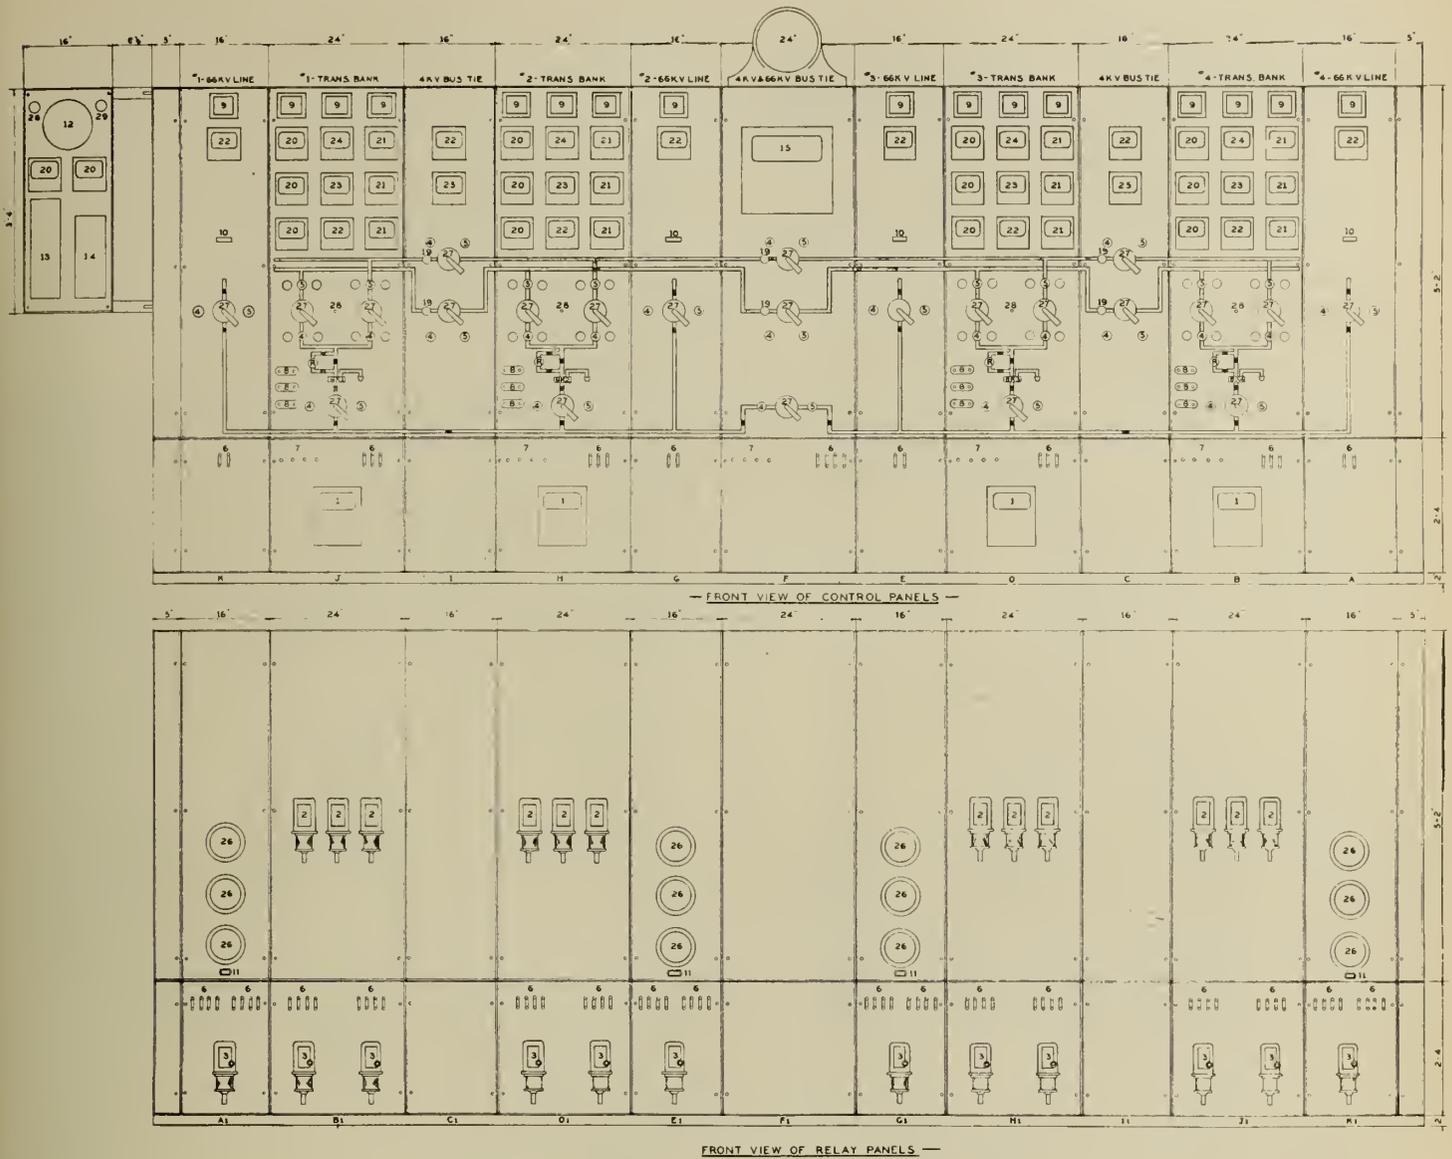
Future Arrangement of 66-Kv. Switchboard.
